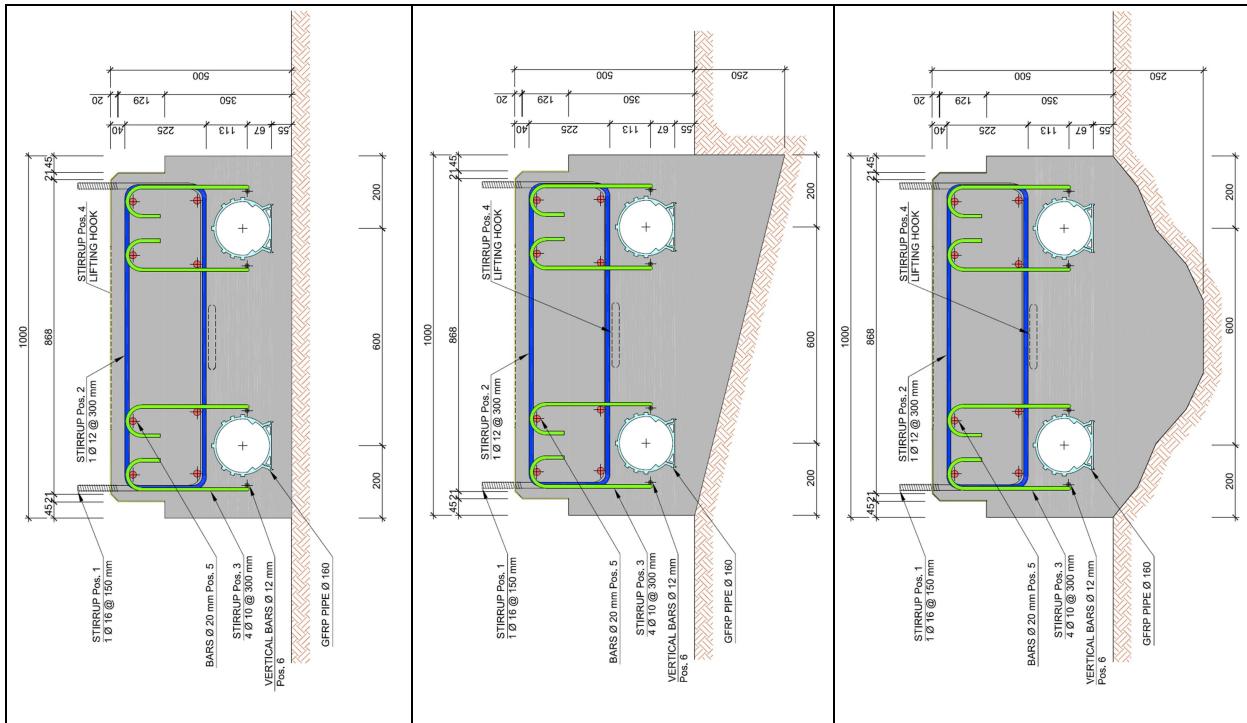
Test concrete beams - Flat face type (left), slanted face (center) and bulged (right)
